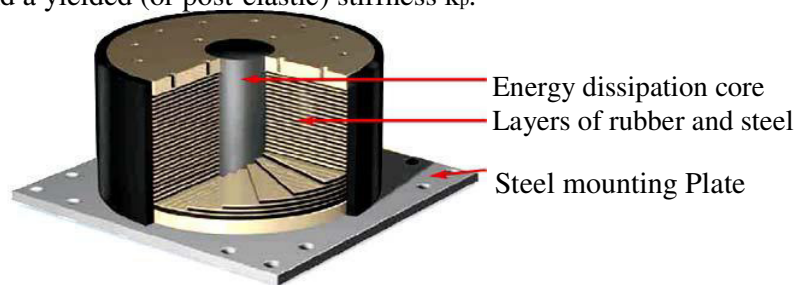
The Lead rubber Bearing. (The top mounting plate is not shown)
